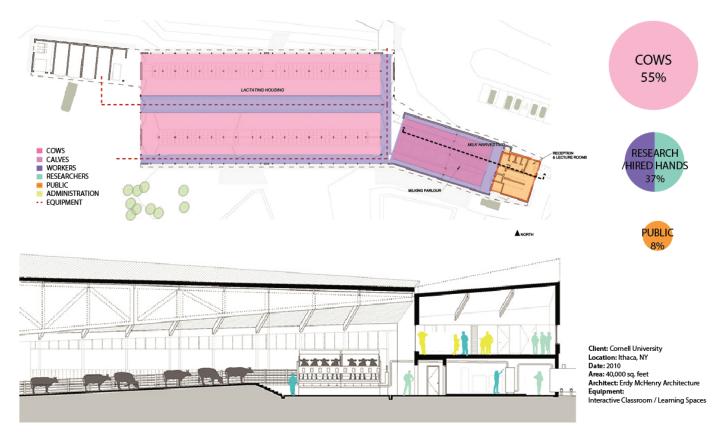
Cornell Teaching Dairy Barn floor area breakdown
